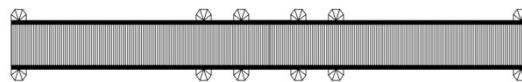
Mughal Bridge Plan (E.g. Mirkadim Bridge)
